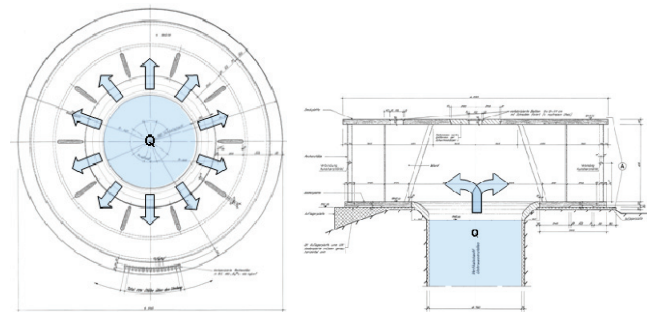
Grimsel II intake/outlet structure in Lake Grimsel; schematic plan view (left) and cross section (right)
